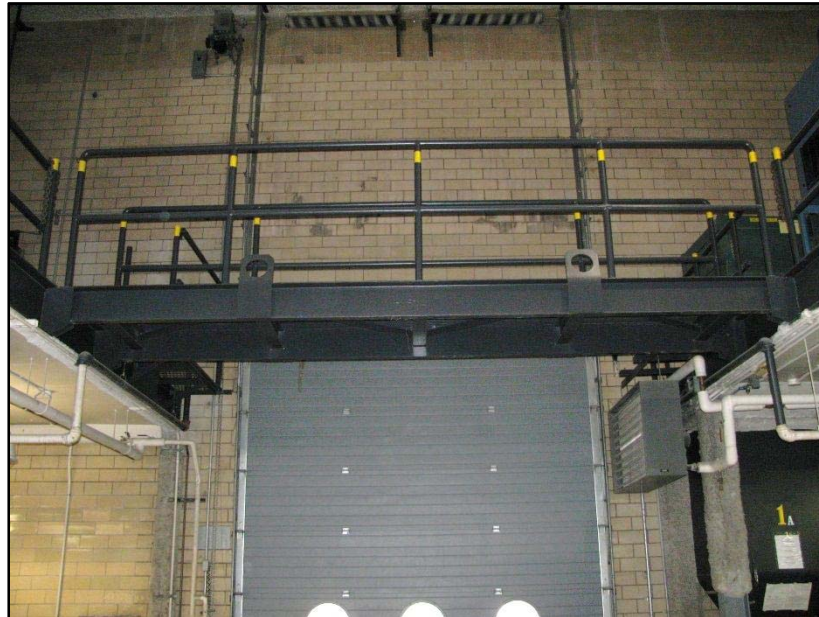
Walking bridge located in Benedict laboratory at MTU.
